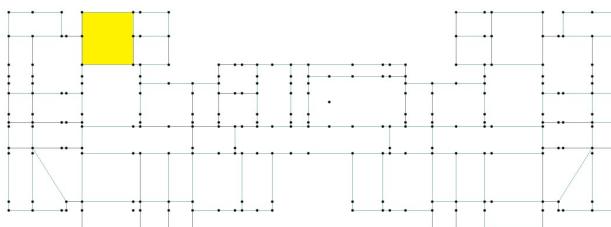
Layout of 3rd floor plan, Detailed Design performed for the highlighted slab.
